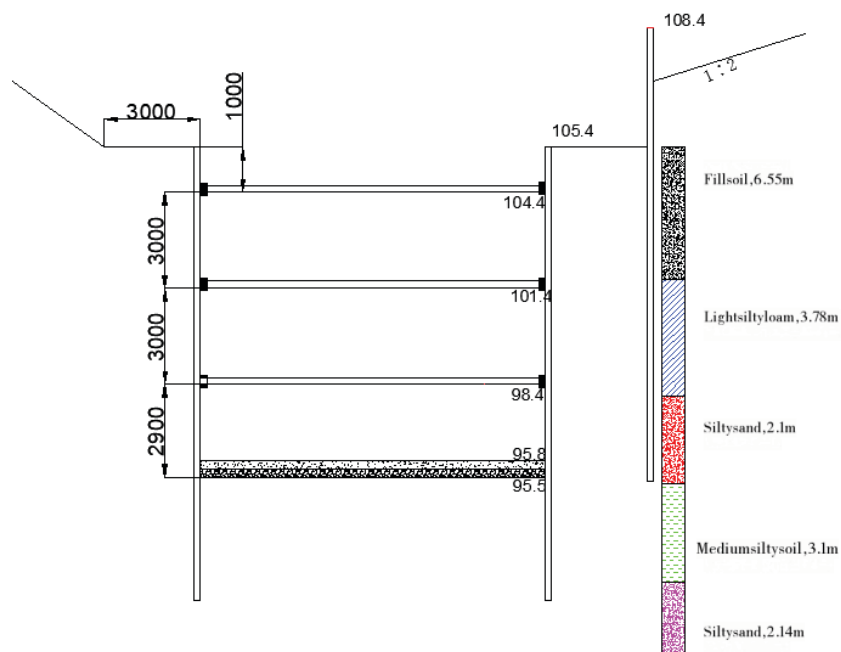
Geological section diagram for inspection and support at abutment area.
